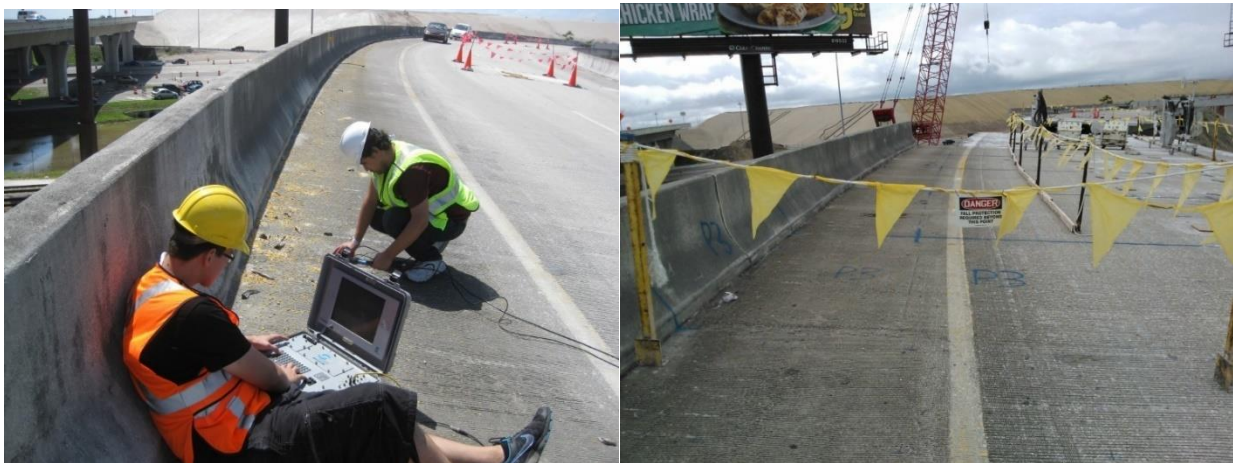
Bridge photo before (1st test on April 27, 2013) and after cutting wing wall and removing bridge segments (2nd test on June 01, 2013).
